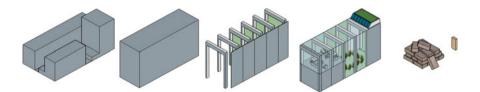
The selection of construction system is the first step to move from the urban massing to the architectural spatial design
